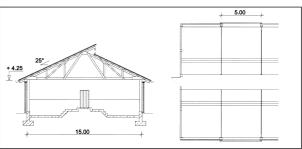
Section and ground plan for keeping fattening pigs on deep litter
